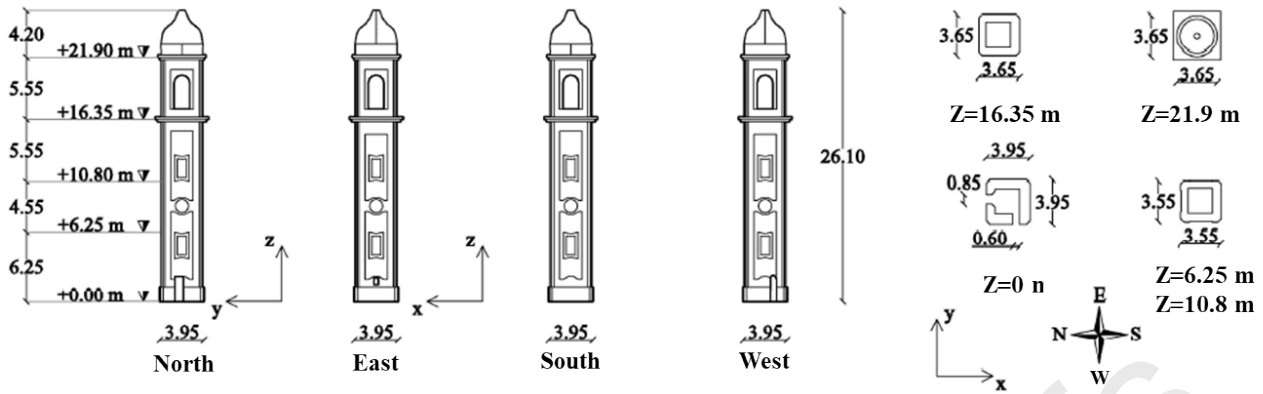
Tower 3. Elevation views, plan and relevant sections of the bell tower with indication of the main geometrical dimensions.
